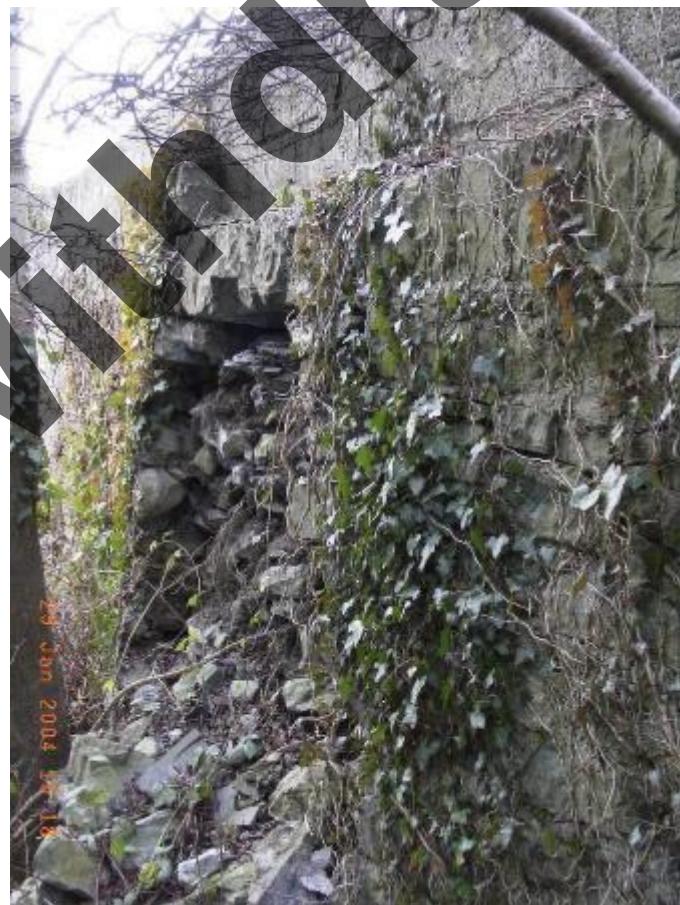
Component No.6 Wing/Spandrel/Retaining Walls - Condition Rating 4
